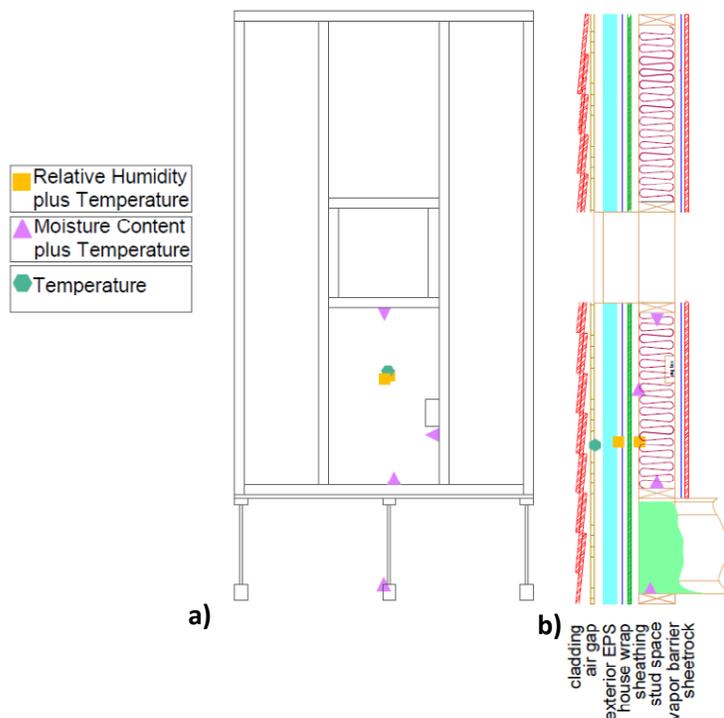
(a) An elevation view of the basic construction of each wall and (b) a cross section of wall 3. All nine walls had similar construction and the same sensor layout.
